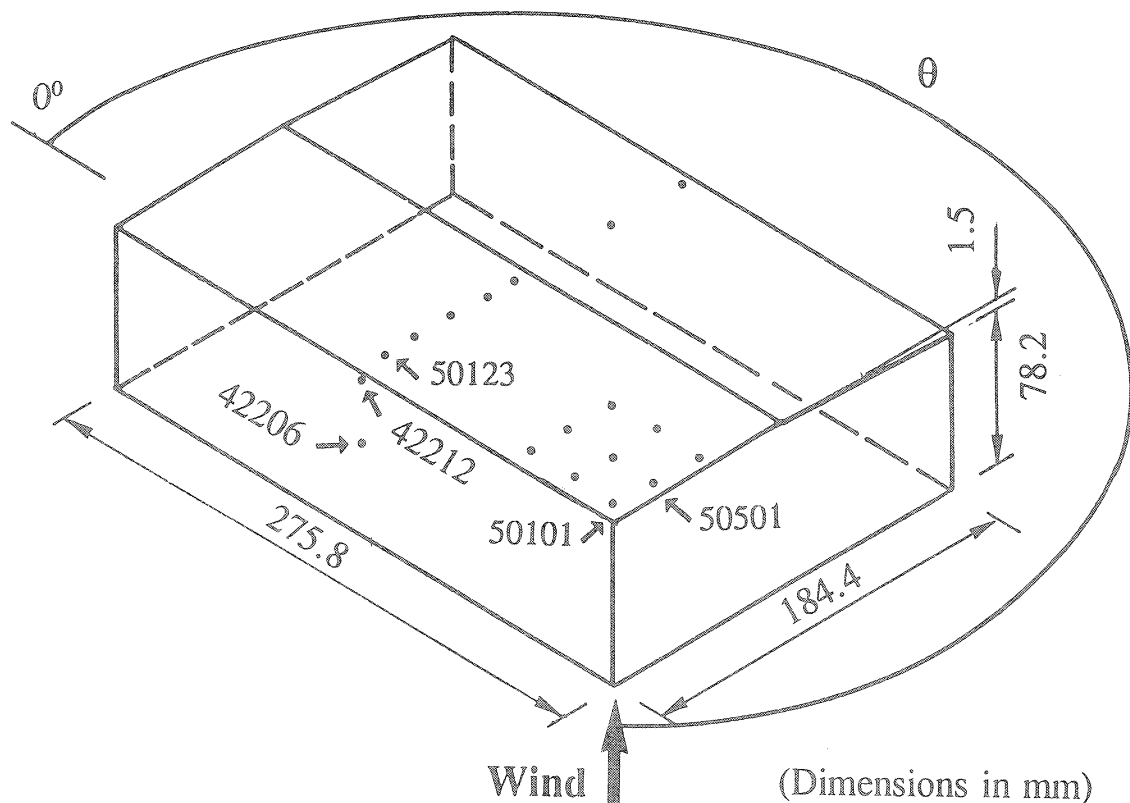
MODEL CONFIGURATION AND PRESSURE TAP LOCATIONS OF TTU BUILDING - WIND AT 225°
